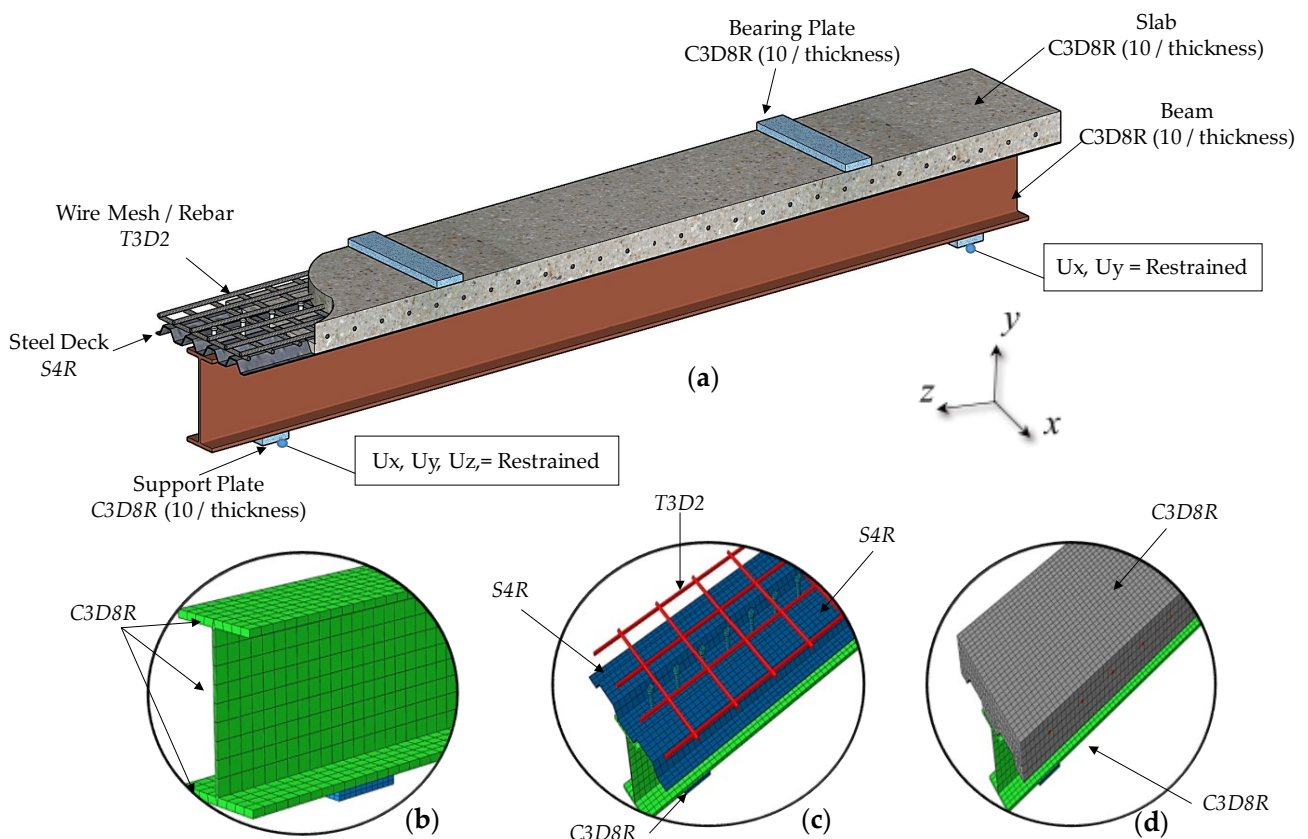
(a) FE model specifics for a typical subassembly configuration with composite floor slab; (b) steel I-beam detail; (c) reinforcement bars, shear stud, and steel deck detail; and (d) slab detail.
